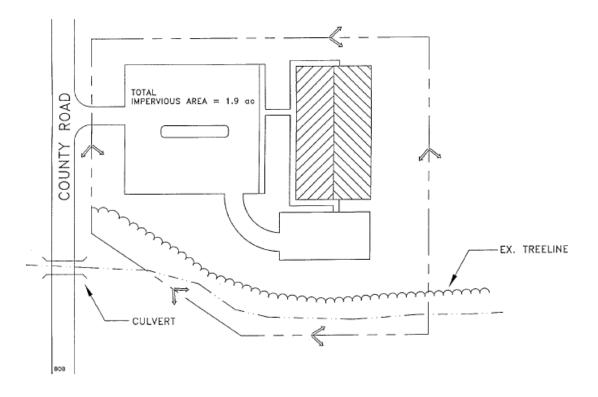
Infiltration Trench Example Site Plan Source: GSMM (2001)
